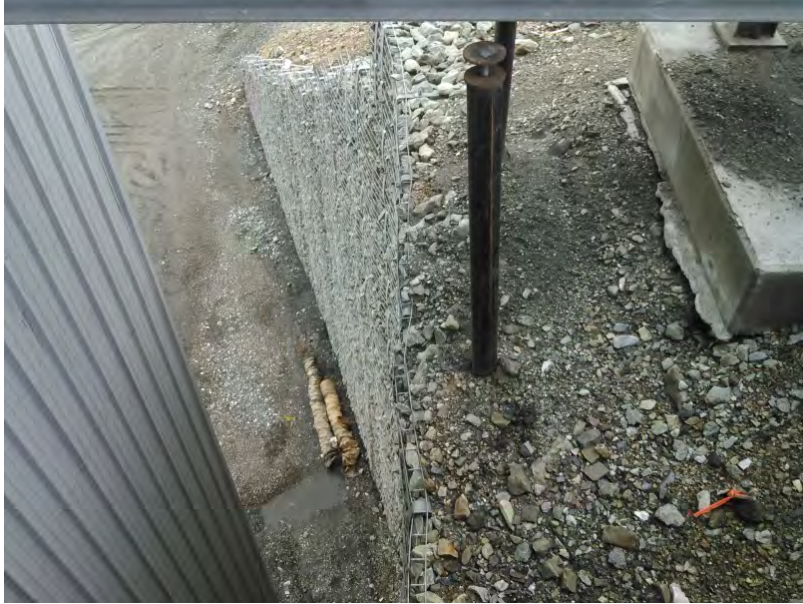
MSE wall at south west corner of crusher building, post offset from vertical, possible indication of movement.
